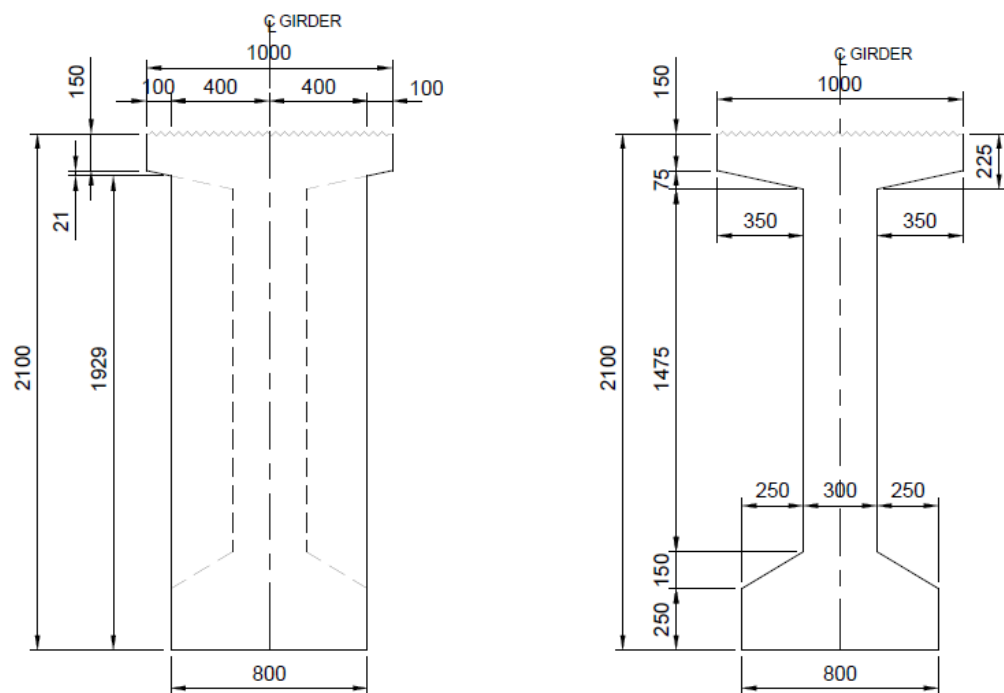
Girder section of 35m span OC post tensioned I girder at support and mid span
